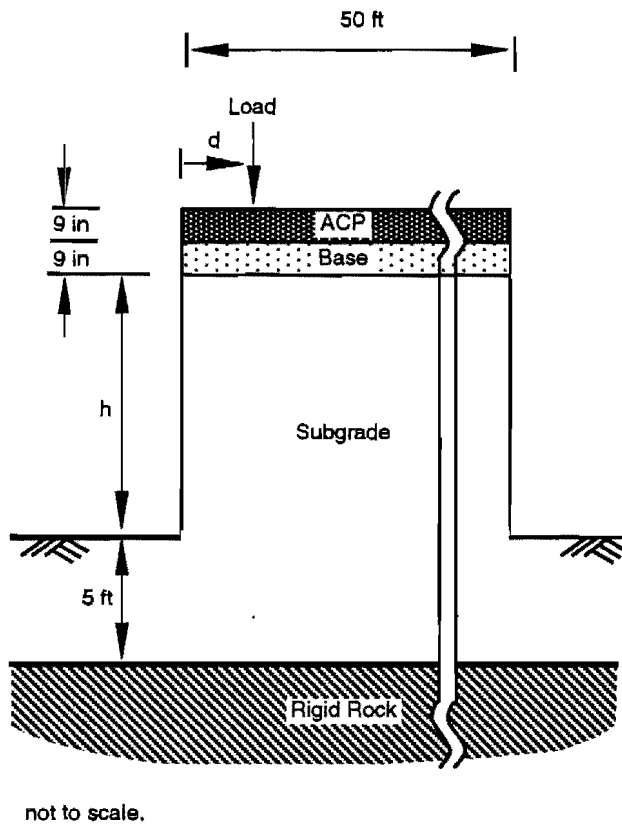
Idealized cross-section of the test site on Route 1, in Austin, Texas without the concrete retaining walls (Profile 3)
